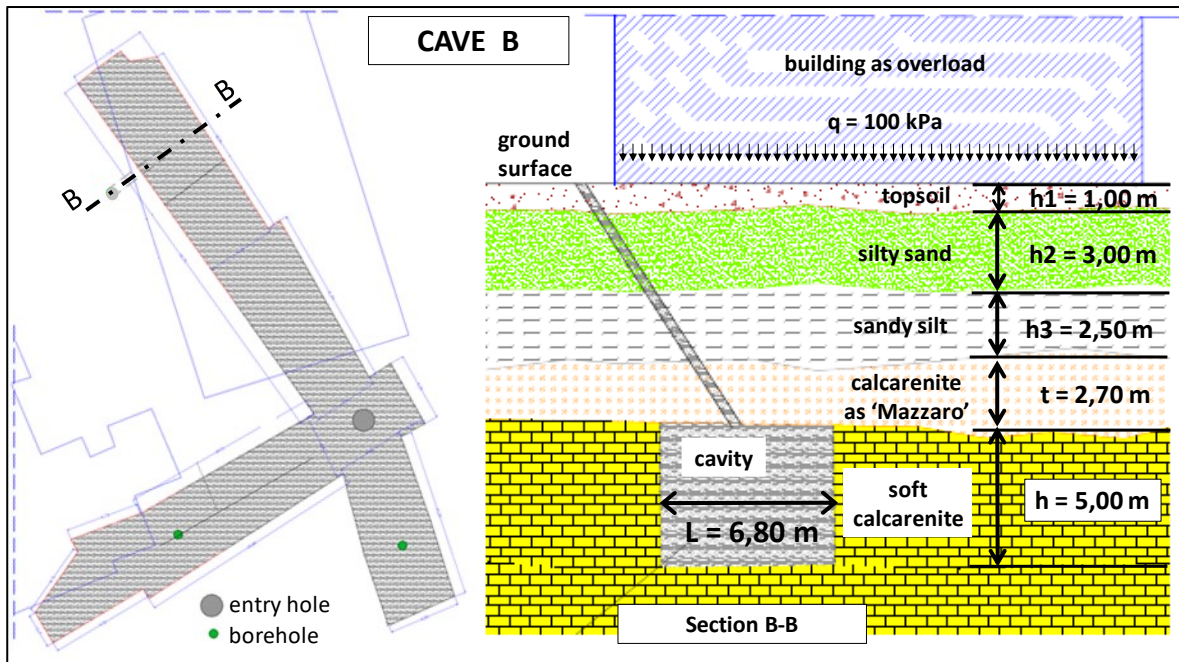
Plan and stratigraphy of the underground cavity B (adapted from Maglio and Ligori, 2014).
